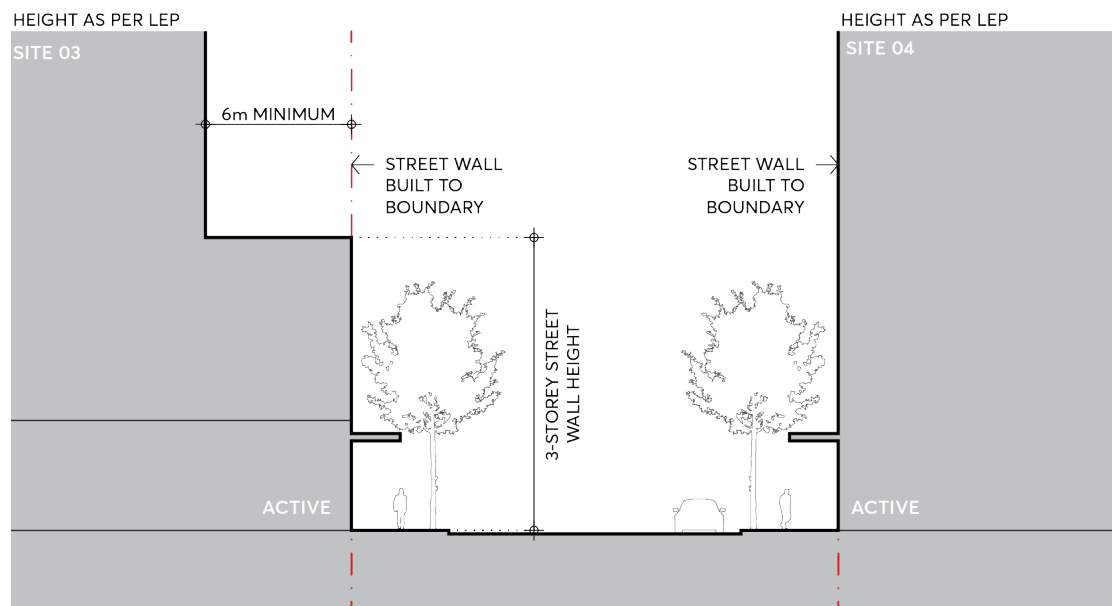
Marion Street (Section A) Setbacks and Street Wall Height
